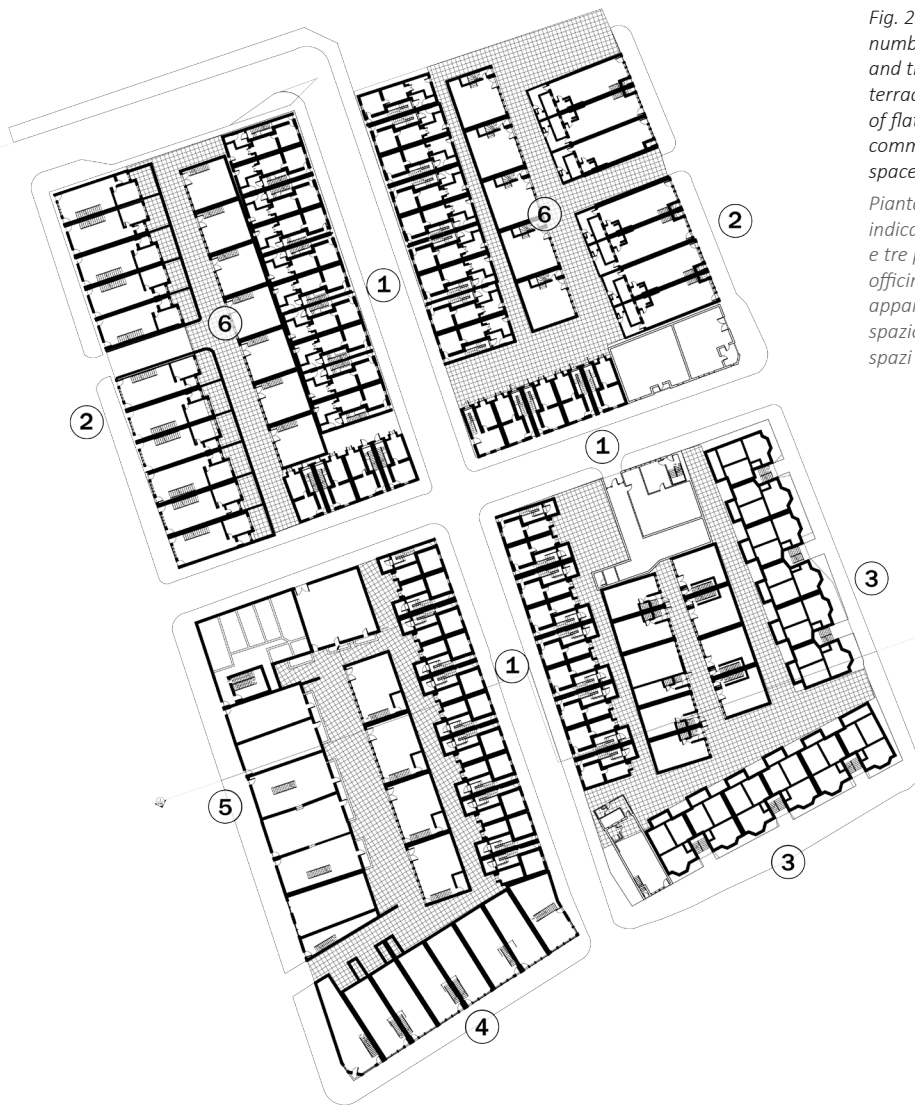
Ground-floor plan of Winkley Estate. The numbers indicate the building types: 1) two- and three-story terraced houses; 2) two-story terraced houses above workshops; 3) blocks of flats; 4) two-story terraced houses above commercial space; 5) buildings with factory spaces; 6) workshops in the interior of blocks.
